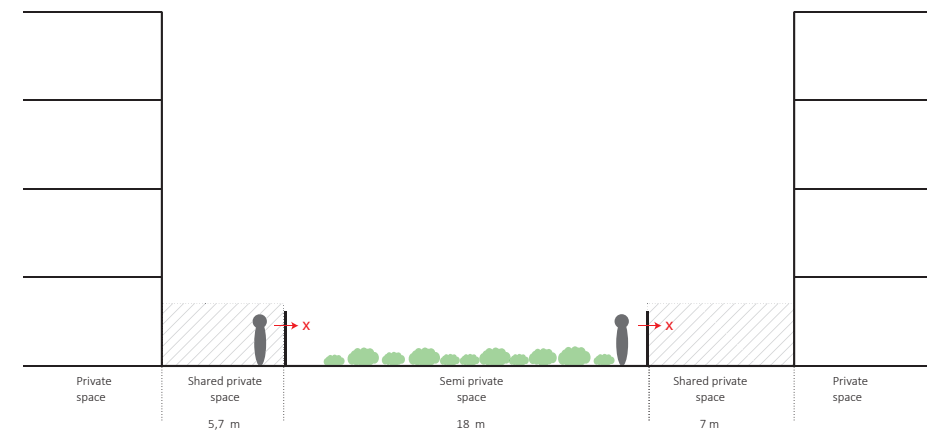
(down) Inside building block Oude Westen, Rotterdam. By author
